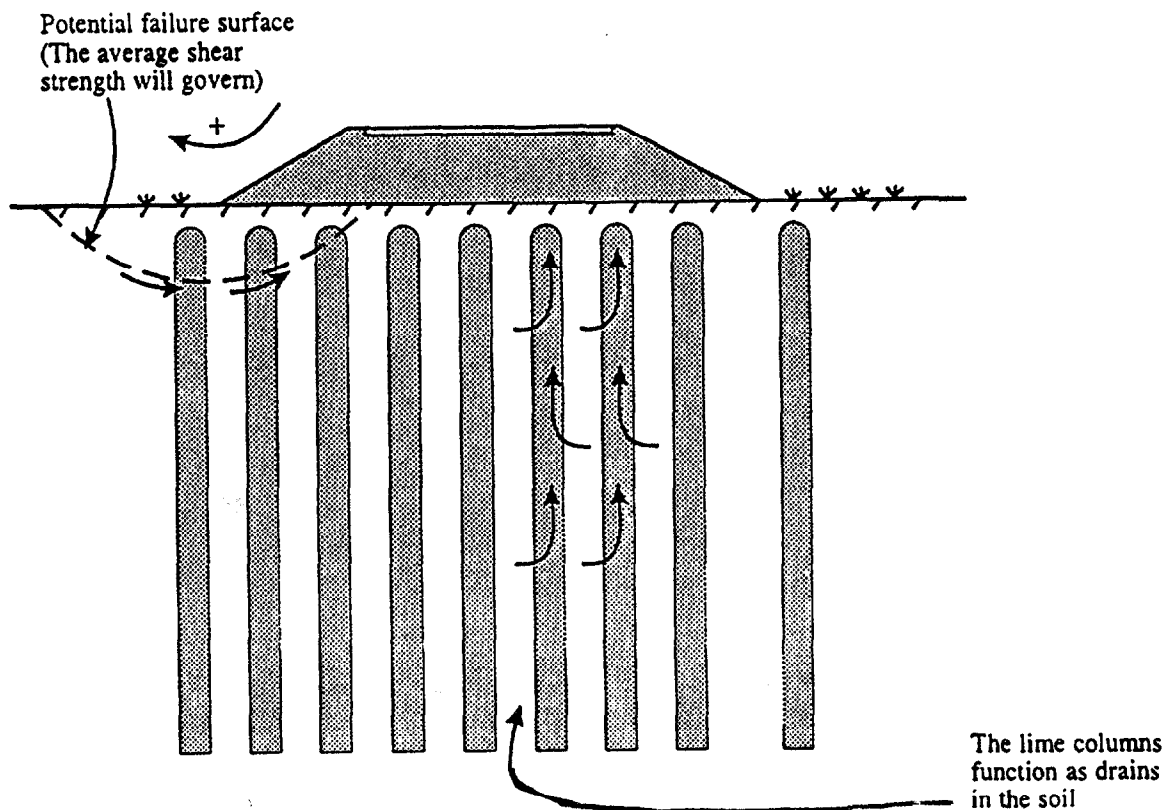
Lime columns used as in situ reinforcement (Stabilator, 1992).
